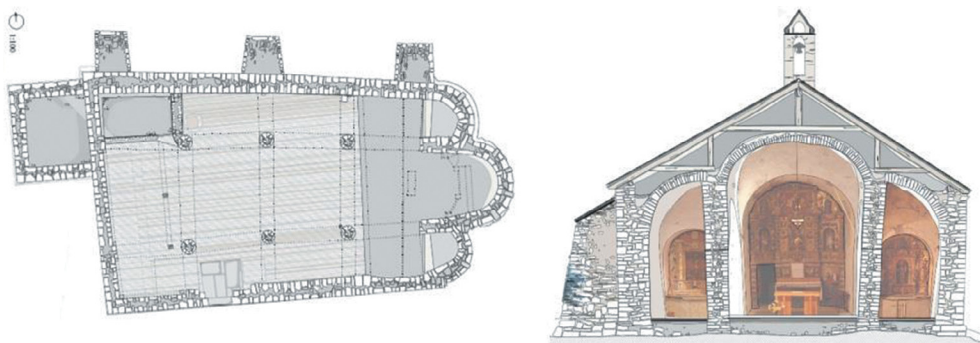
Plan and section of Santa Eulària d'Unha [11].
